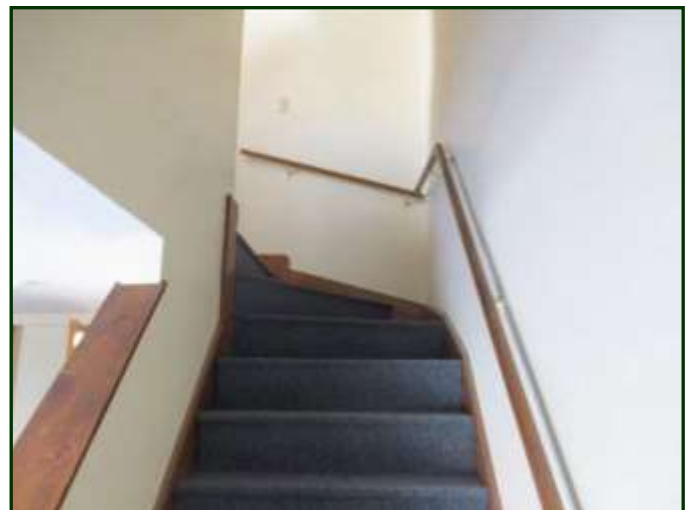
Stairs at east side of building. Note carpet treads and risers and wood handrail
